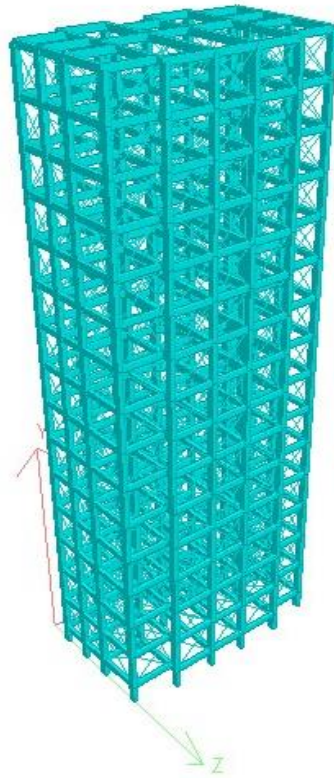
3-D model of 15 storey residential building in STAADPro
